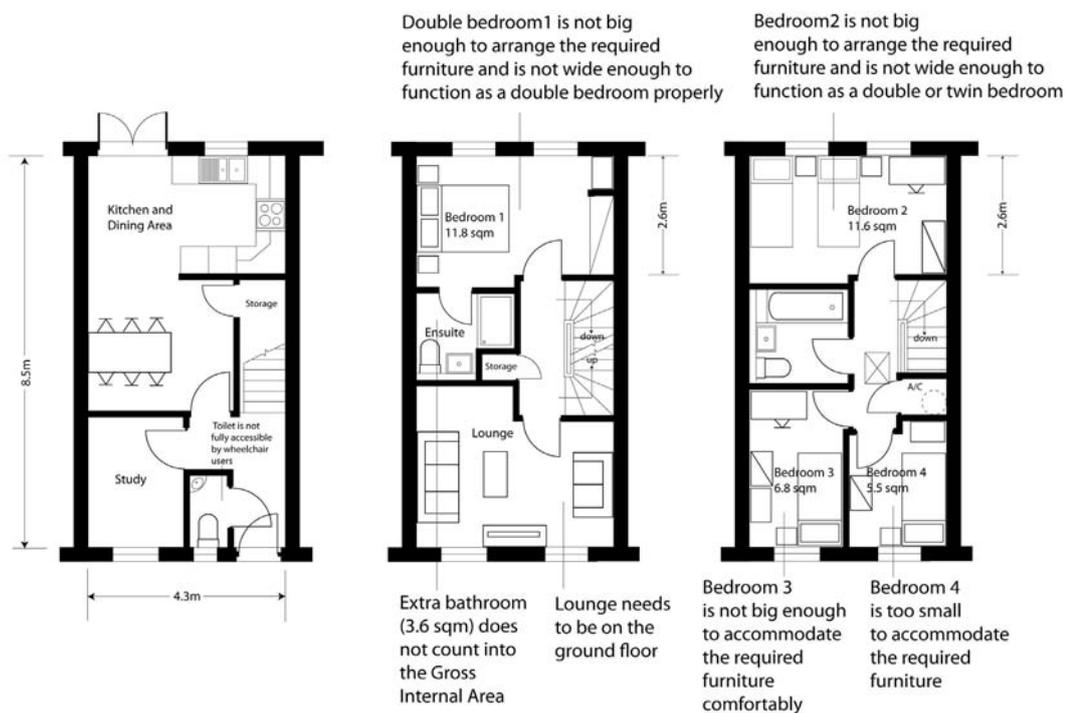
Typical volume house builder’s 4 bedroom townhouse type, Gross Internal Floor Area 106 sq metres.
